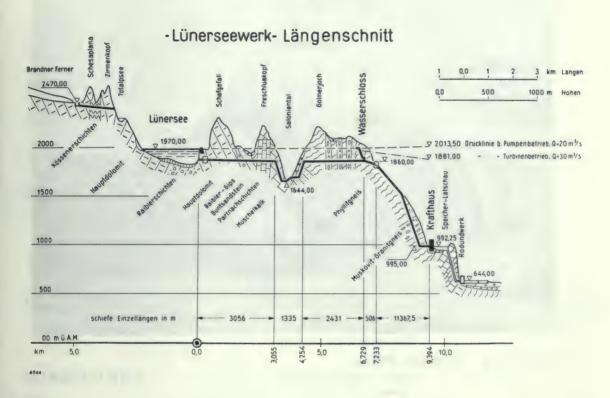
Plan and Profile of Lünersee and Rodund System.
